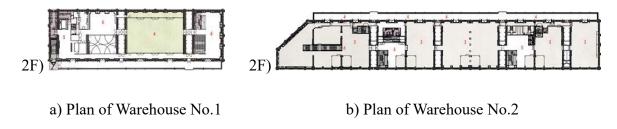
Red Brick Warehouse Plans (Source: Bibliography [105])
